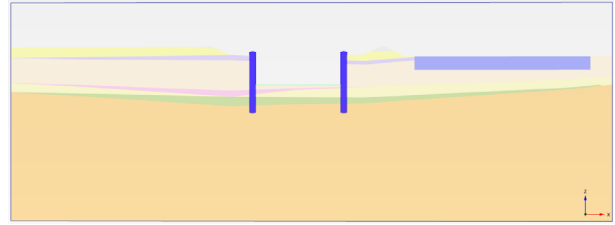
Section C-C crossing the excavation. Structural elements are blended out.
